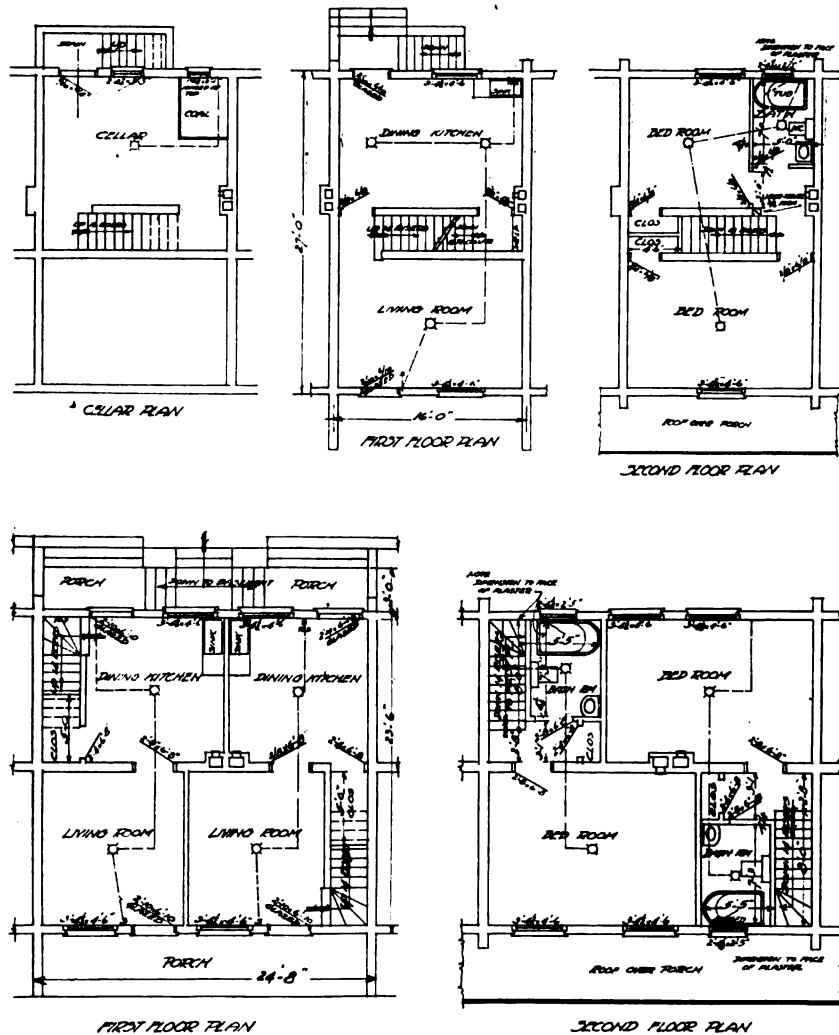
A AND B—TYPICAL FLOOR PLANS. (A) SINGLE FAMILY UNIT. (B) DOUBLE HOUSE. (C) SEE NEXT PAGE—TRIPLE FAMILY UNIT
